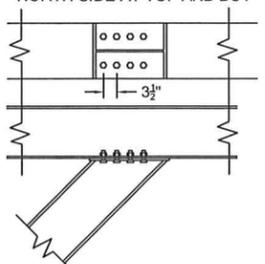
PLATE DIMENSIONS, 0.8" THICK AT ANGLE BRACES
